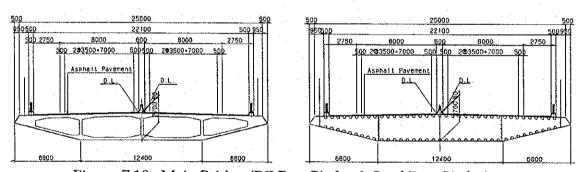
Main Bridge (PC Box Girder & Steel Box Girder)
